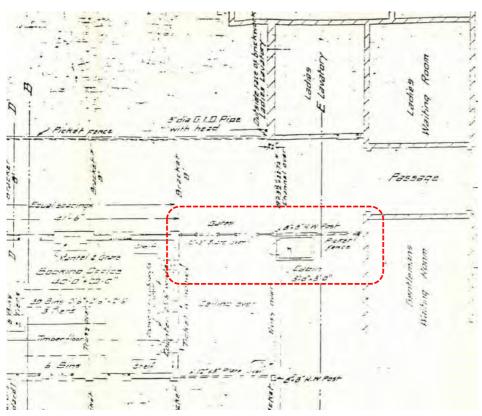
Extract from 1915 plans showing fence and gate along passage between platforms. (Source: Sheedy CMP 1988)
